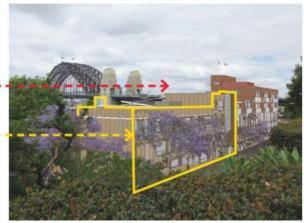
| Proposed View – Ground Floor Area, 50-58 Upper Pitt Street
